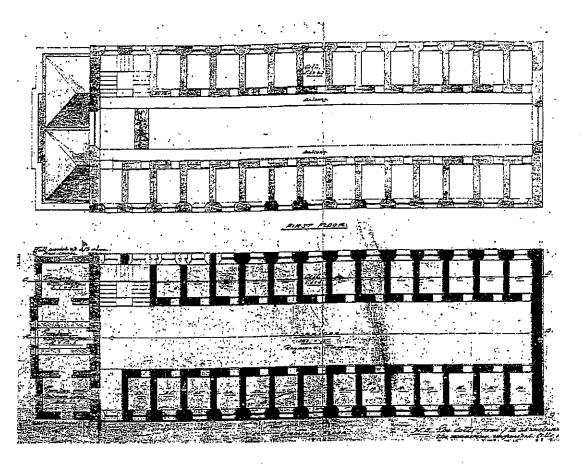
Ground and First Floor Plans of 'B' Wing, Note in Lewis' handwriting reads: cells from 7 to 26 inclusively have been covered in (illegible) the remaining unfinished cells on the ground floor will shortly be ready for the ceiling plates'. (Detail from DPW&S Plan Room Drawing No. PC321/40)
